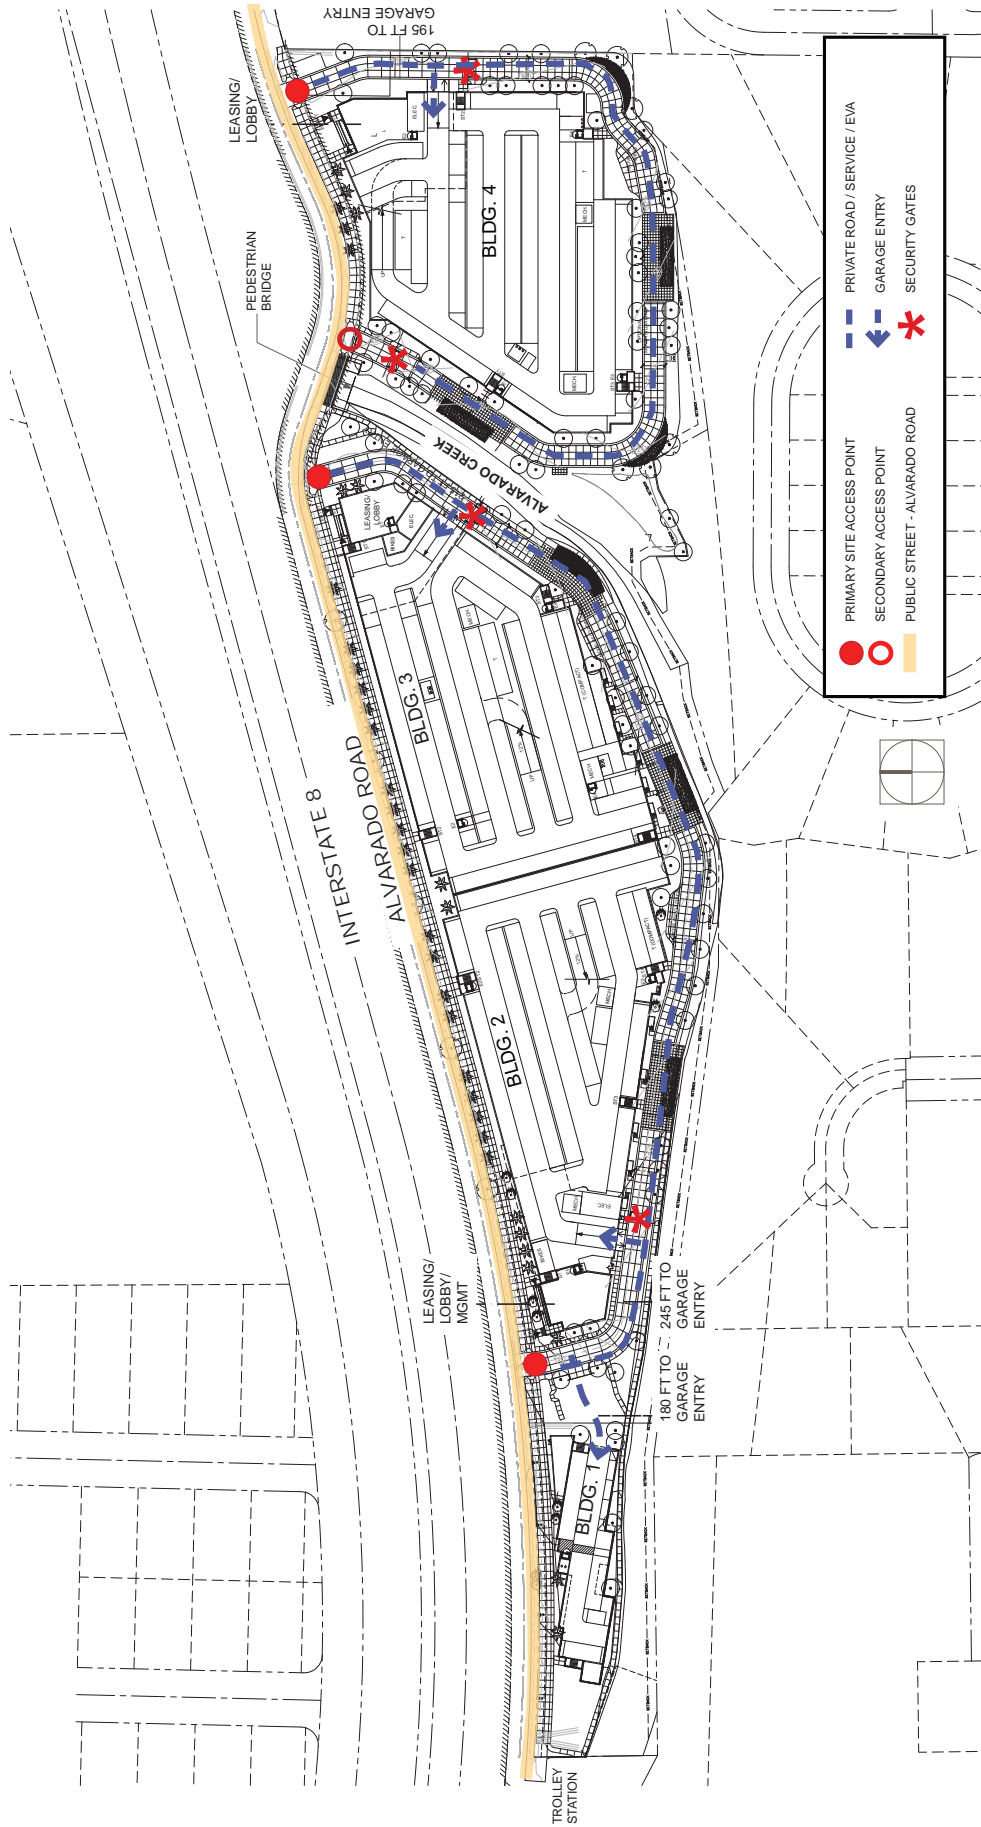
Plan View to Show Site Access Points and Distance to Parking Structure Entries and Security Gates
